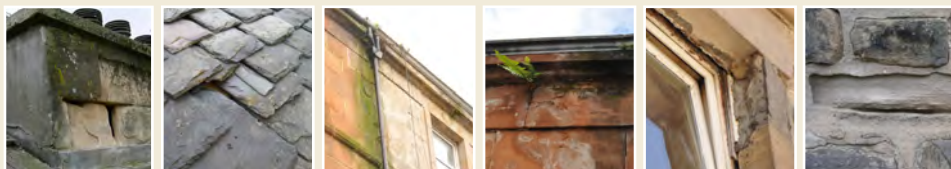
Typical signs of disrepair (left to right): Decayed stonework on chimneys can be dangerous; slipped roof slates can be spotted from a high point such as a neighbour's flat; blocked and rusted downpipes can lead to damp stonework and rot in internal timbers; gutters need to be cleaned at least once a year to remove leaves and bird guano; defective mastic around windows allows draughts and damp into the building; cement mortar leads to stone decay.
